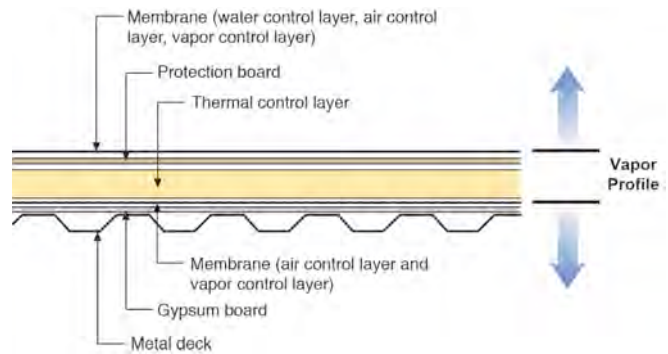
Compact Roof Assembly—Control layers are provided above and below the thermal control layer. The typical roof membrane functions as the water control layer, an air control layer and a vapor control layer above the thermal control layer – the “insulation”. A second membrane or layer or layers are provided below the thermal control layer – the “insulation” – and the function of this membrane or layers is to function as an air control layer and vapor control layer. The intent is to keep the “rain” and “air” and “vapor” from getting into the assembly from the top (“outside”) and to keep the “air” and “vapor” from getting into the thermal control layer from the bottom (“inside”).
